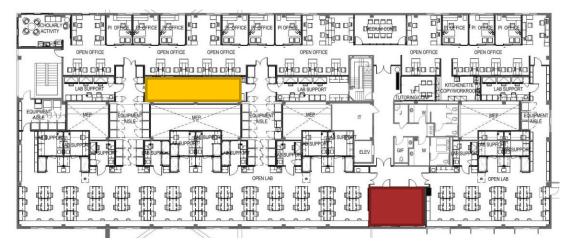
Location of Shared Laboratory Support Rooms (gold) and Plant Growth Rooms (brown) on a Prototypical Floor
